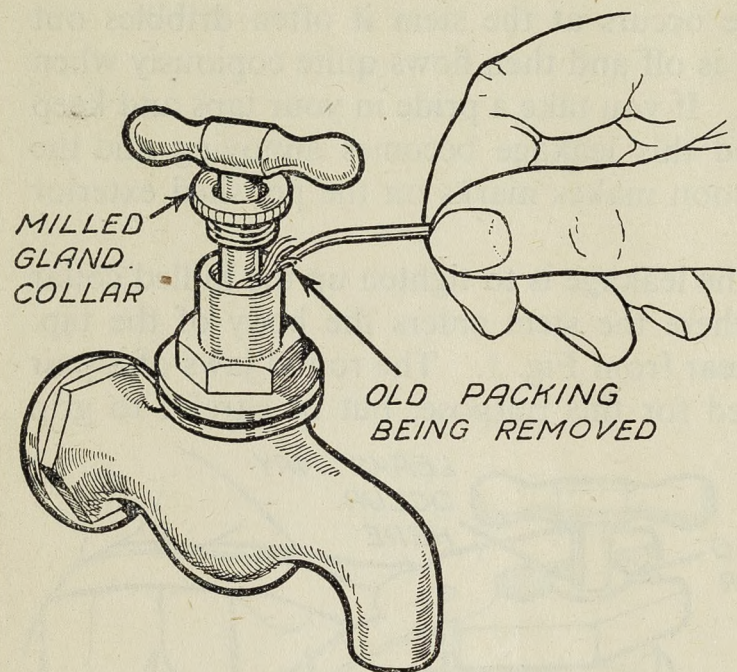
If tightening the packing gland will not stop the leak the packing must be removed as shown here. A piece of string will do for a new packing.
